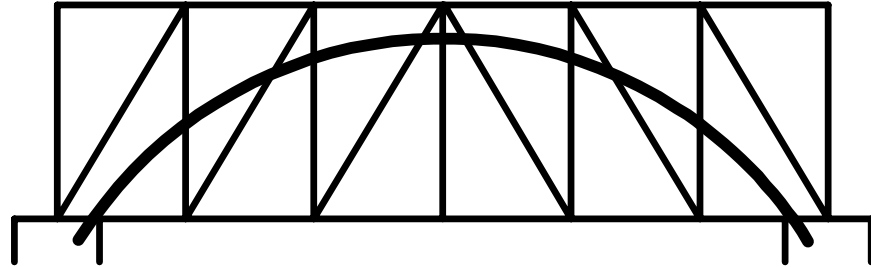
Schematic of Burr Arch-truss Covered Bridge
